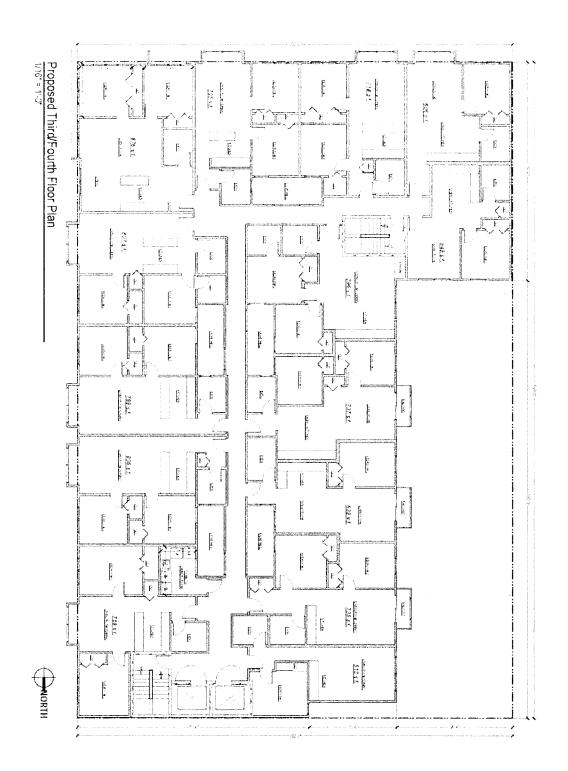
Third/Fourth Floor Plan 480 Potrero Avenue
